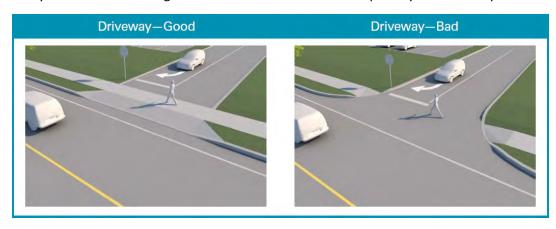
Sidewalk and Driveways (Source: CSDG)
